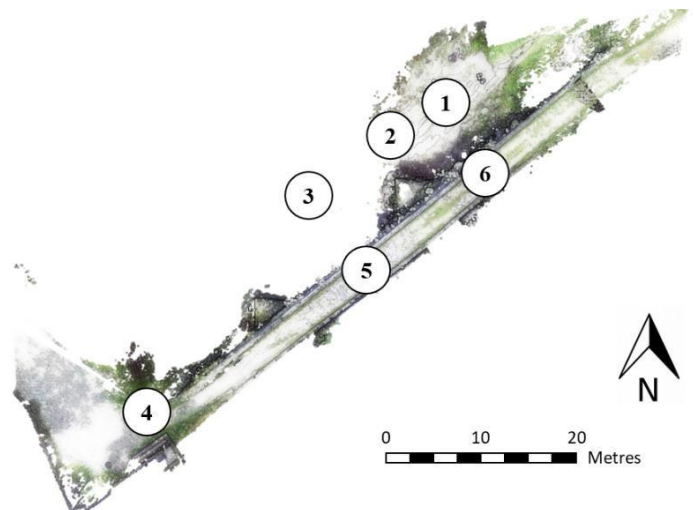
Top view of the point cloud bridge and acquisition plan.
